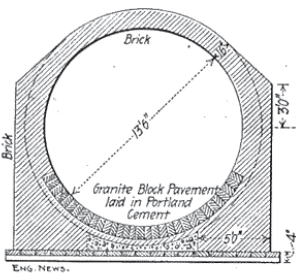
Section of Sewer Masonry in Open-Cut Tunnel, 60th St. Sewer Tunnel, Brooklyn, N. Y.
